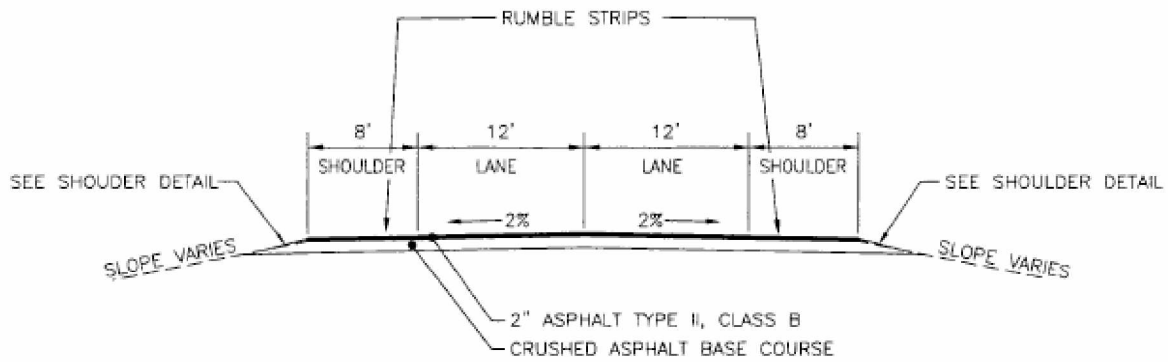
Moose Creek, pavement structure I (image courtesy ADOT&PF)
